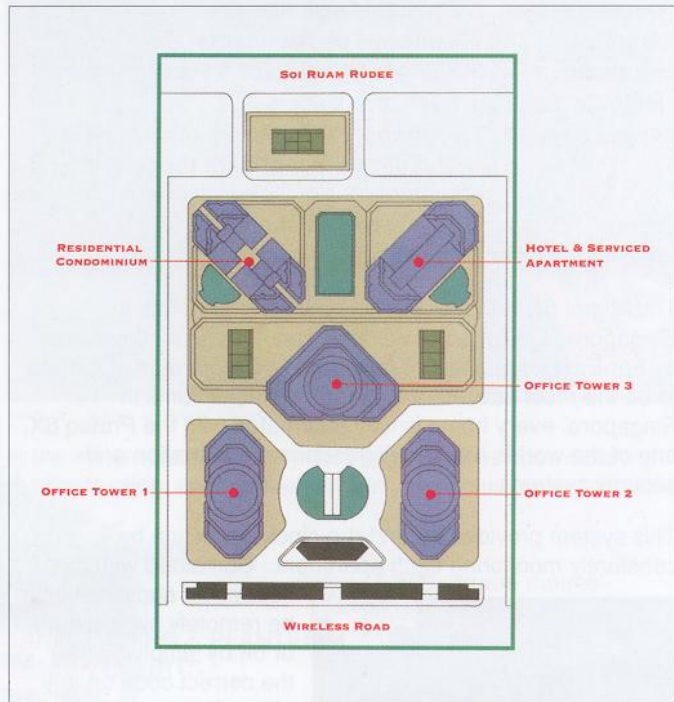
SITE PLAN OF ALL SEASONS PLACE
